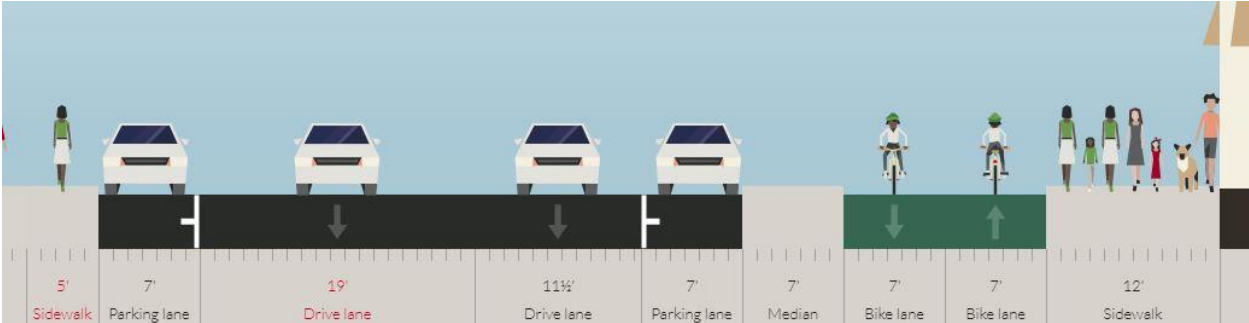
Typical Cross Section of Howard Street between 5th and 4th and 4th streets, looking east
